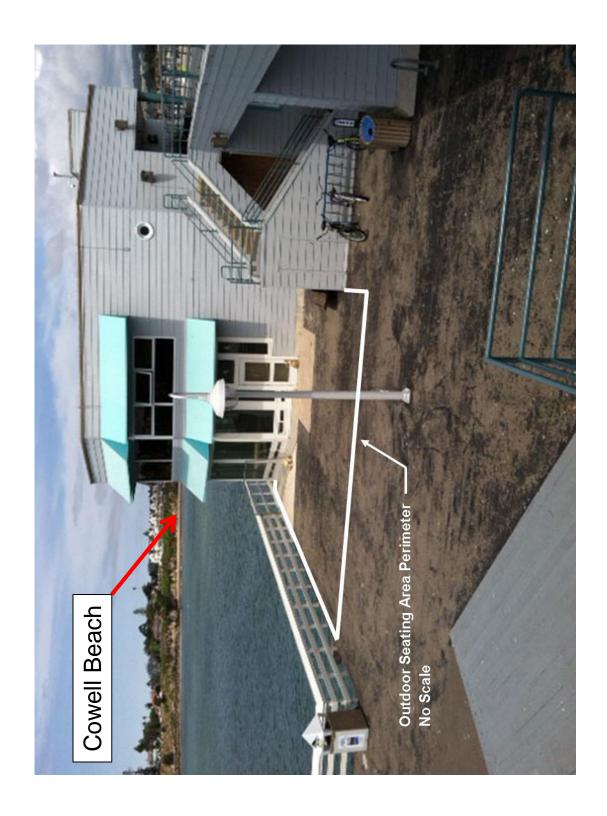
Project Photos 3-81-041-A24 Page 3 of 3
